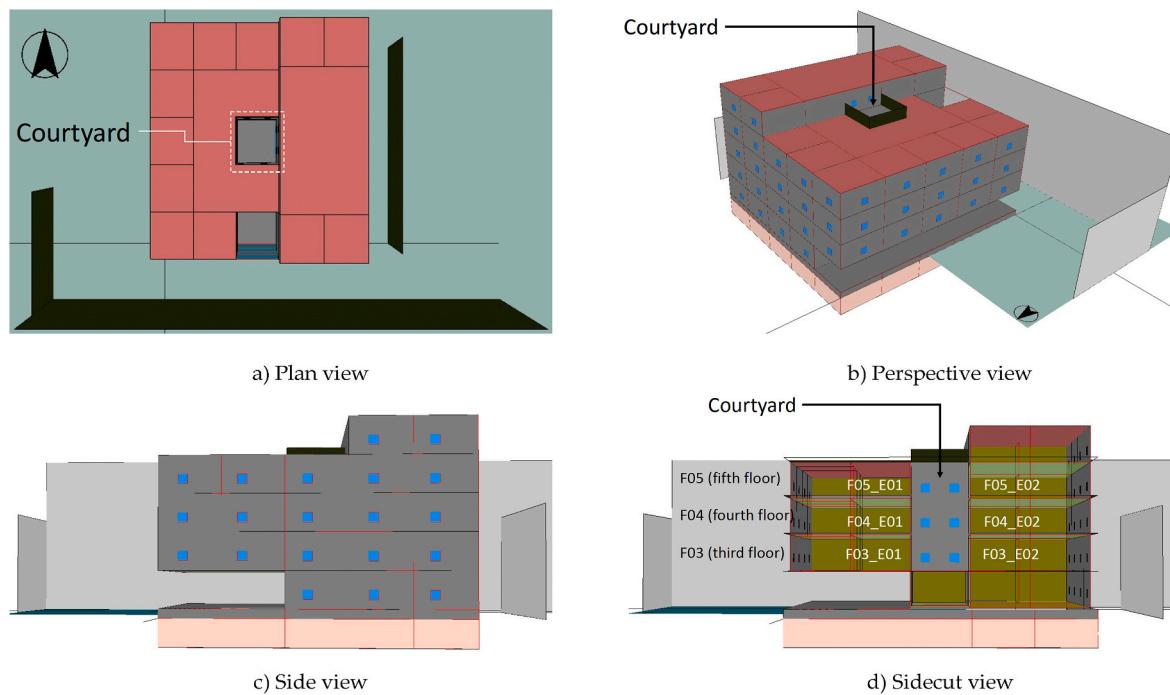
General view of the graphical model of the building. Grey: exterior elements, red: roof elements, green: interior elements.
